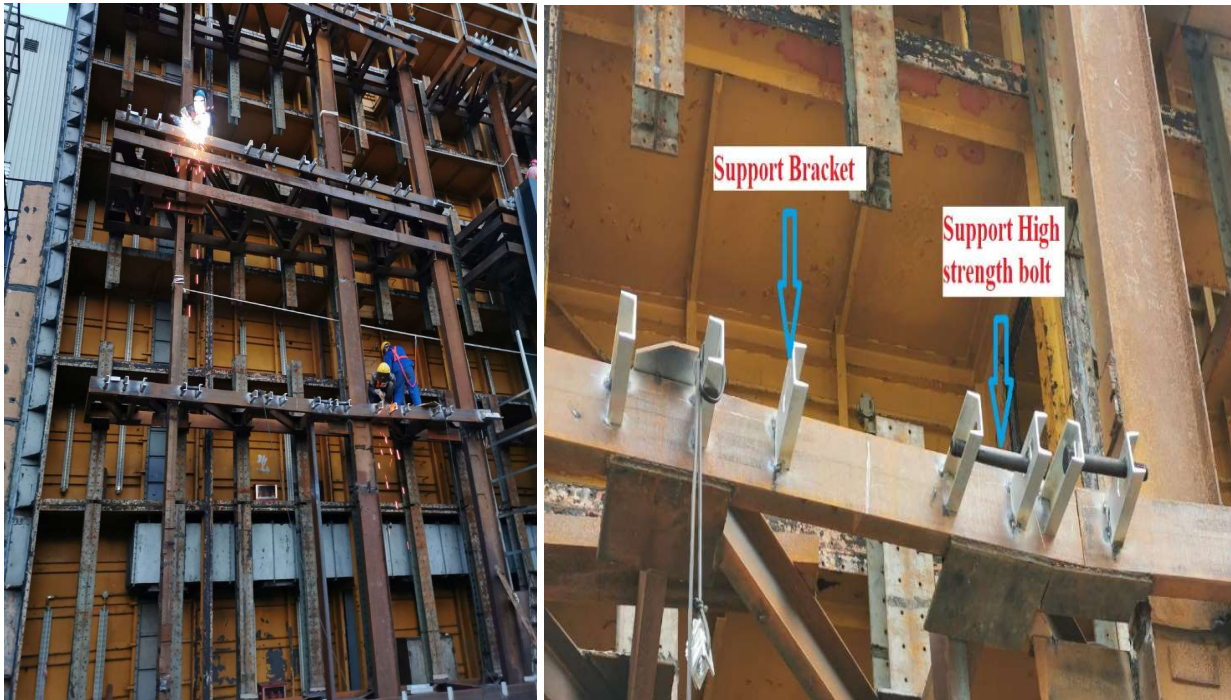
Curtain wall support bracket and High-strength bolt welding
